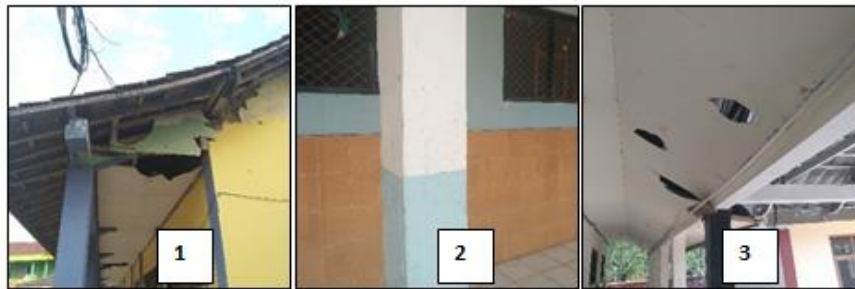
Condition of School Structure (1) Damaged Roof and Ceiling at MTs Masyariqul Anwar; (2) Cracked Column at SDN Mekarjaya 3; (3) Perforated ceiling at SDN Tamanjaya 2
